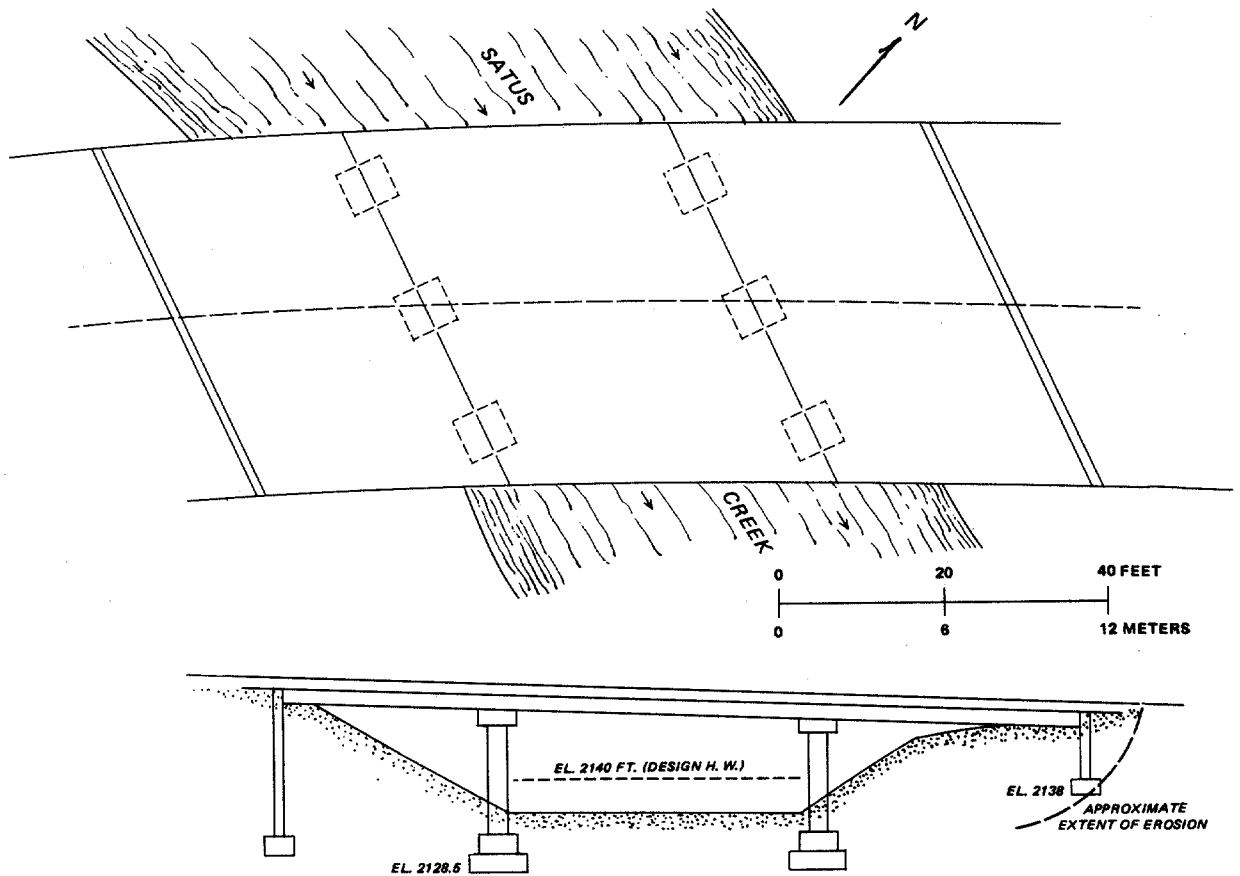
Sketch of plan (top) and elevation (bottom) for bridge at fifth crossing of Satus Creek.
